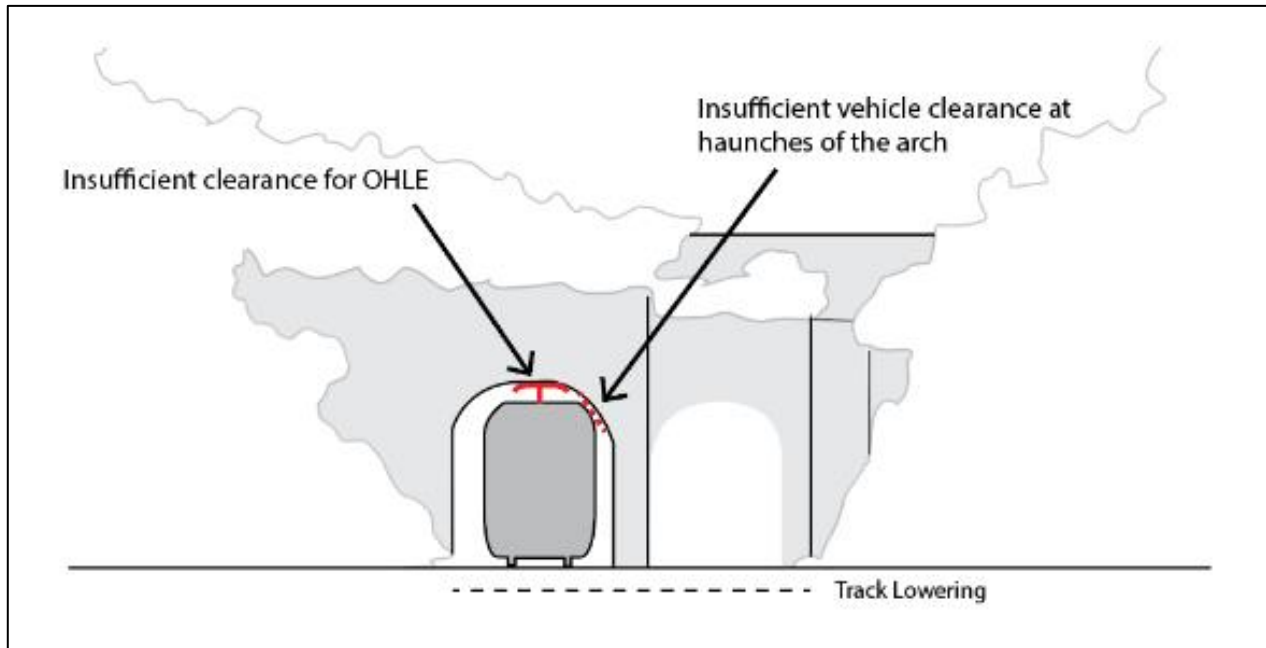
Twin Arch Bridge (OBO8) on Phoenix Park Tunnel Branch Line
